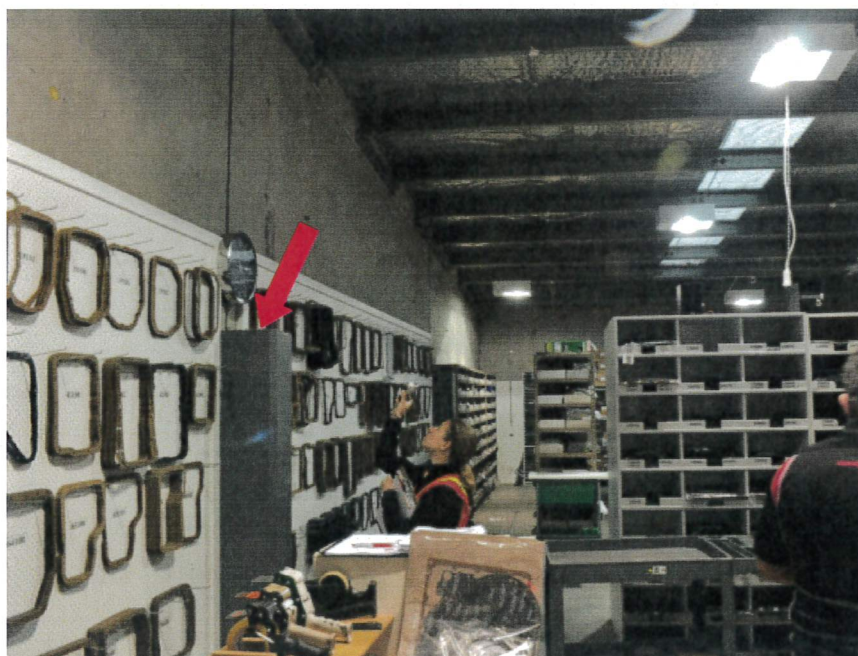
Interior of unit 3, note half-height concrete column at panel joint
